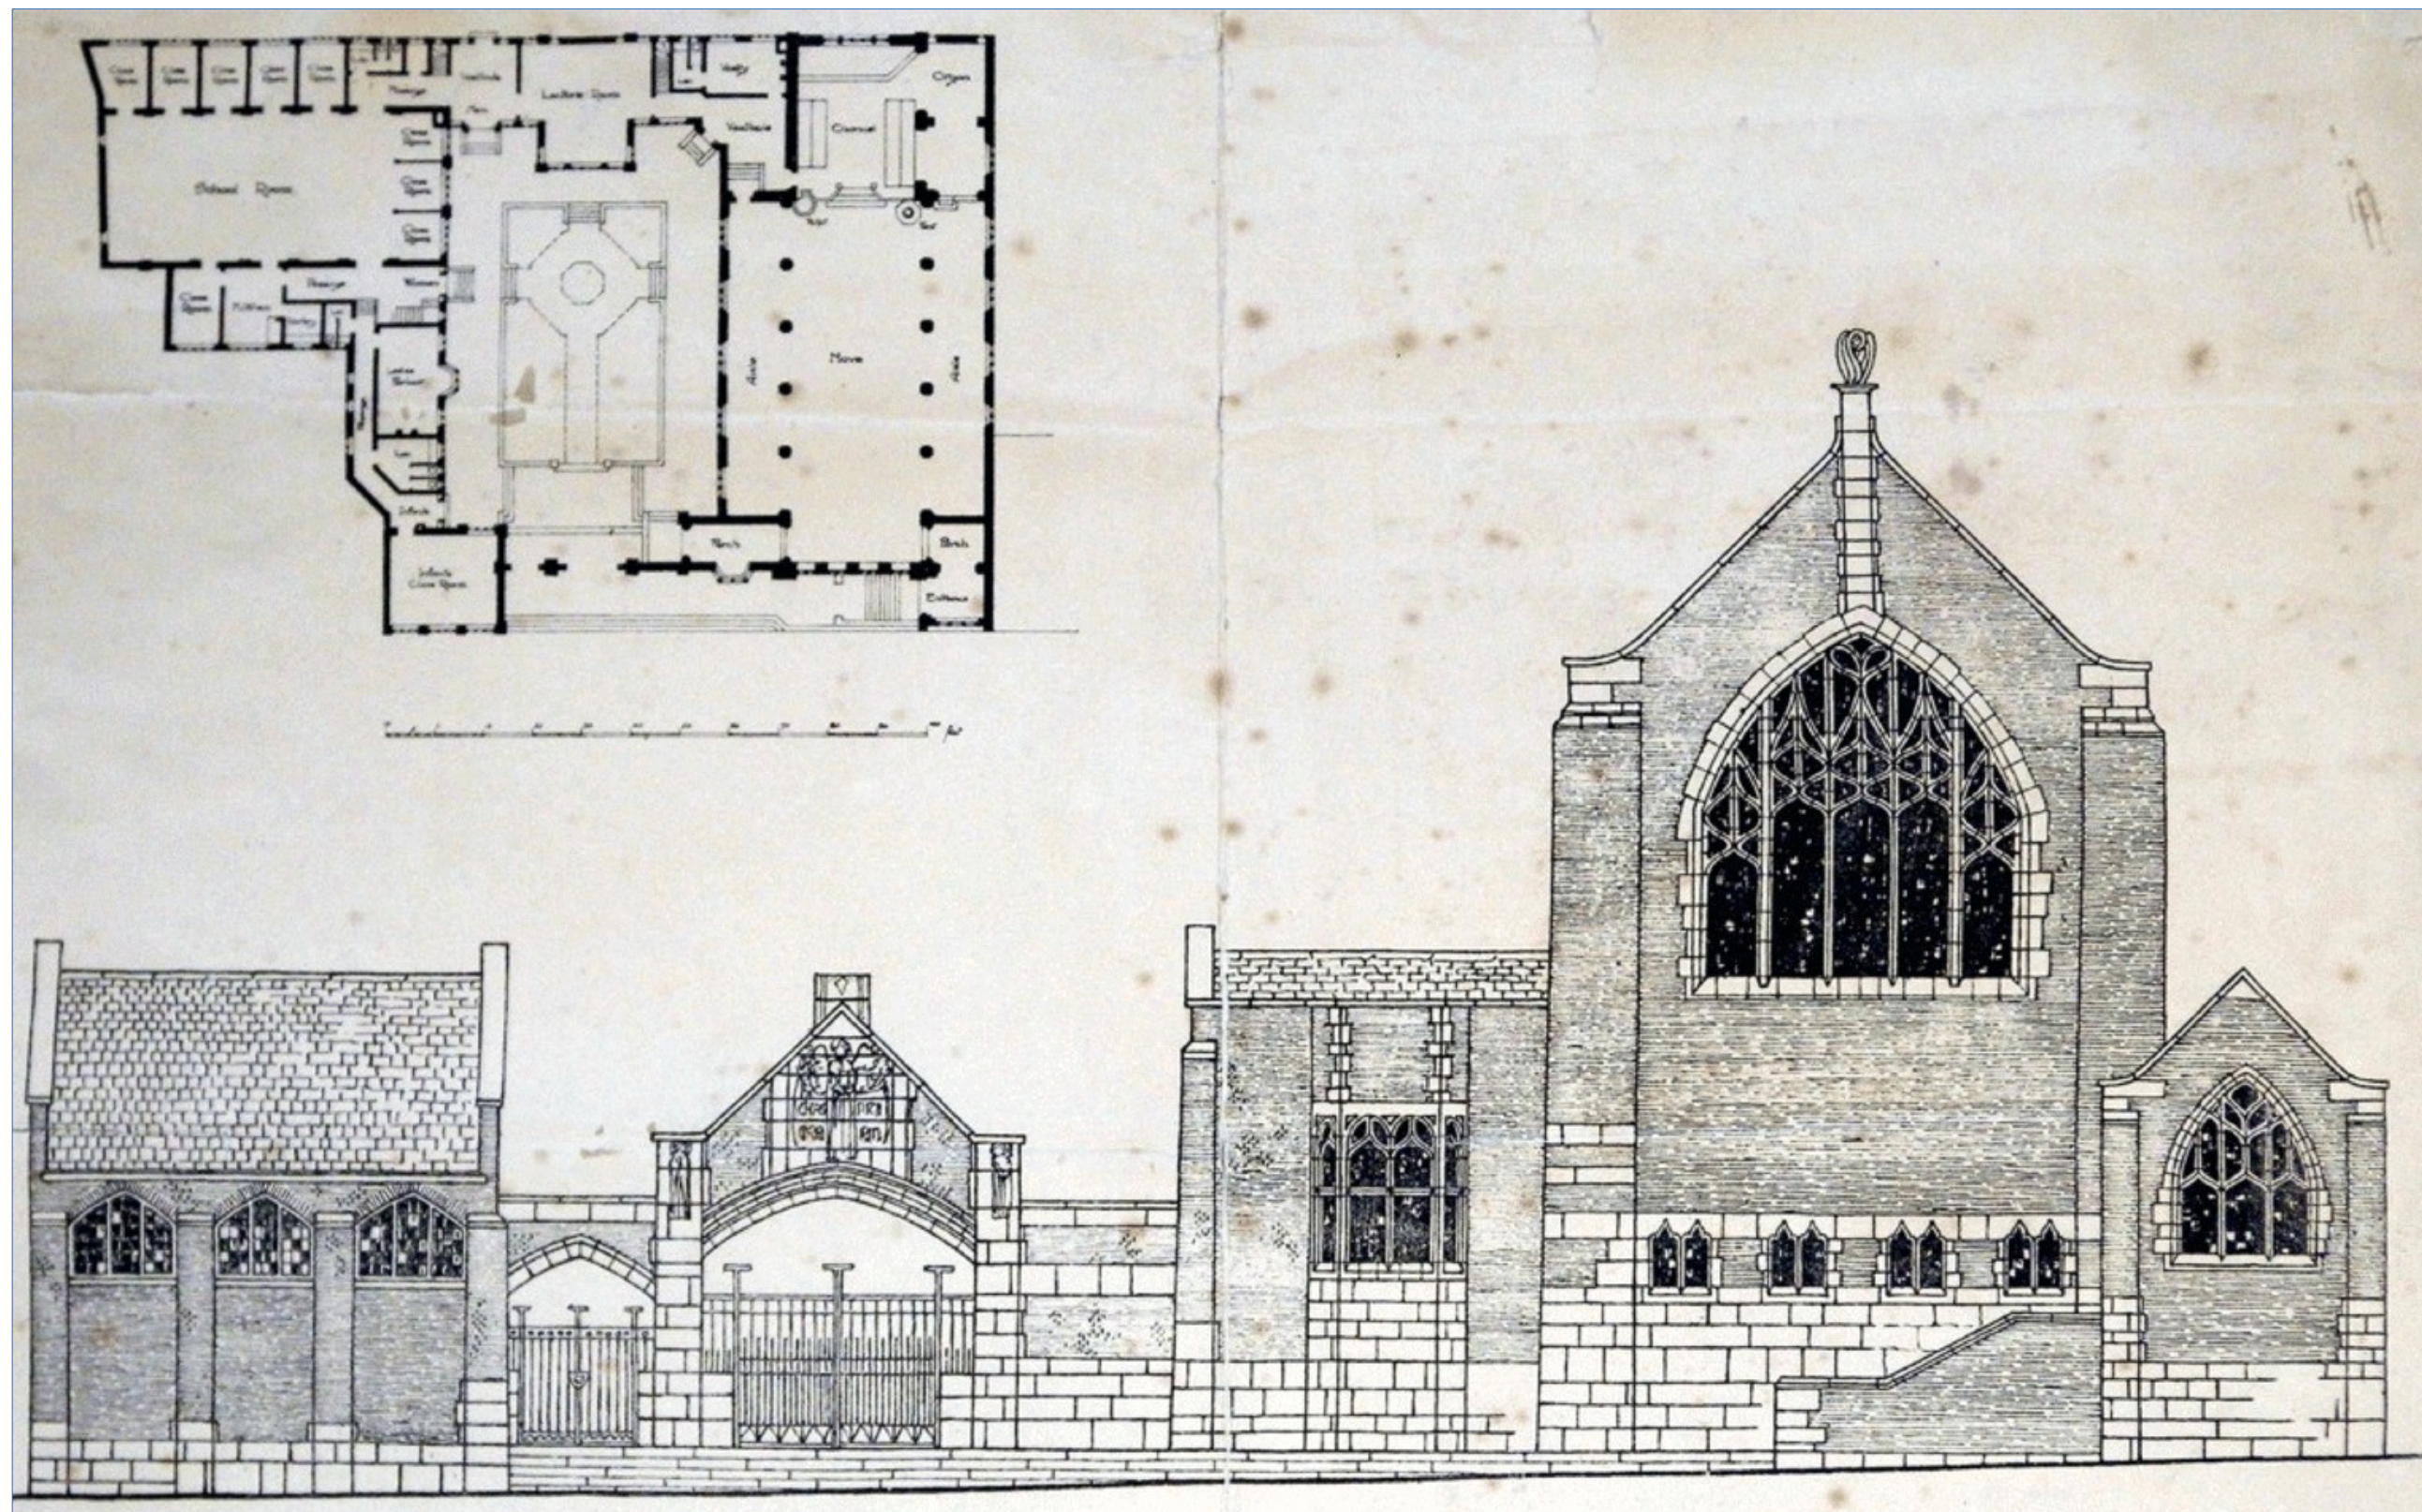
Plan and Drawing of Eastern Elevation to Long Street
